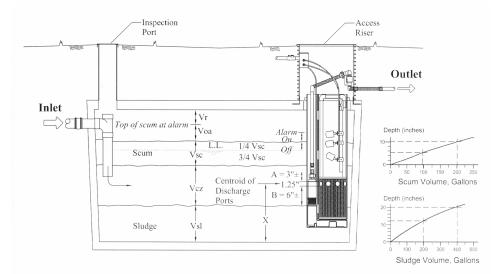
Typical 1000-gal. Concrete Dosing Septic Tank with Sludge and Scum
